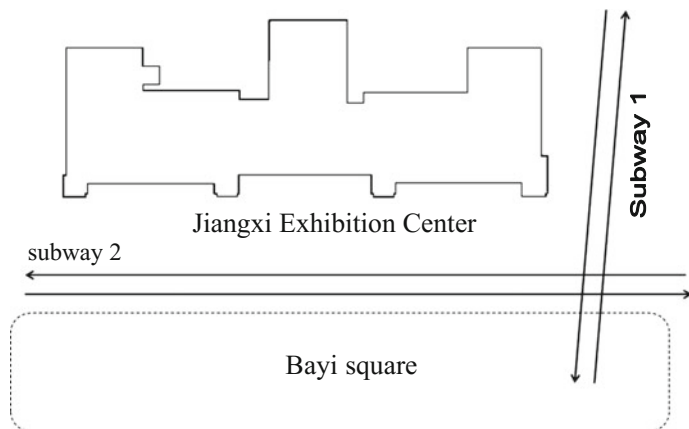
Plan sketch of Jiangxi Exhibition Center and the subways
